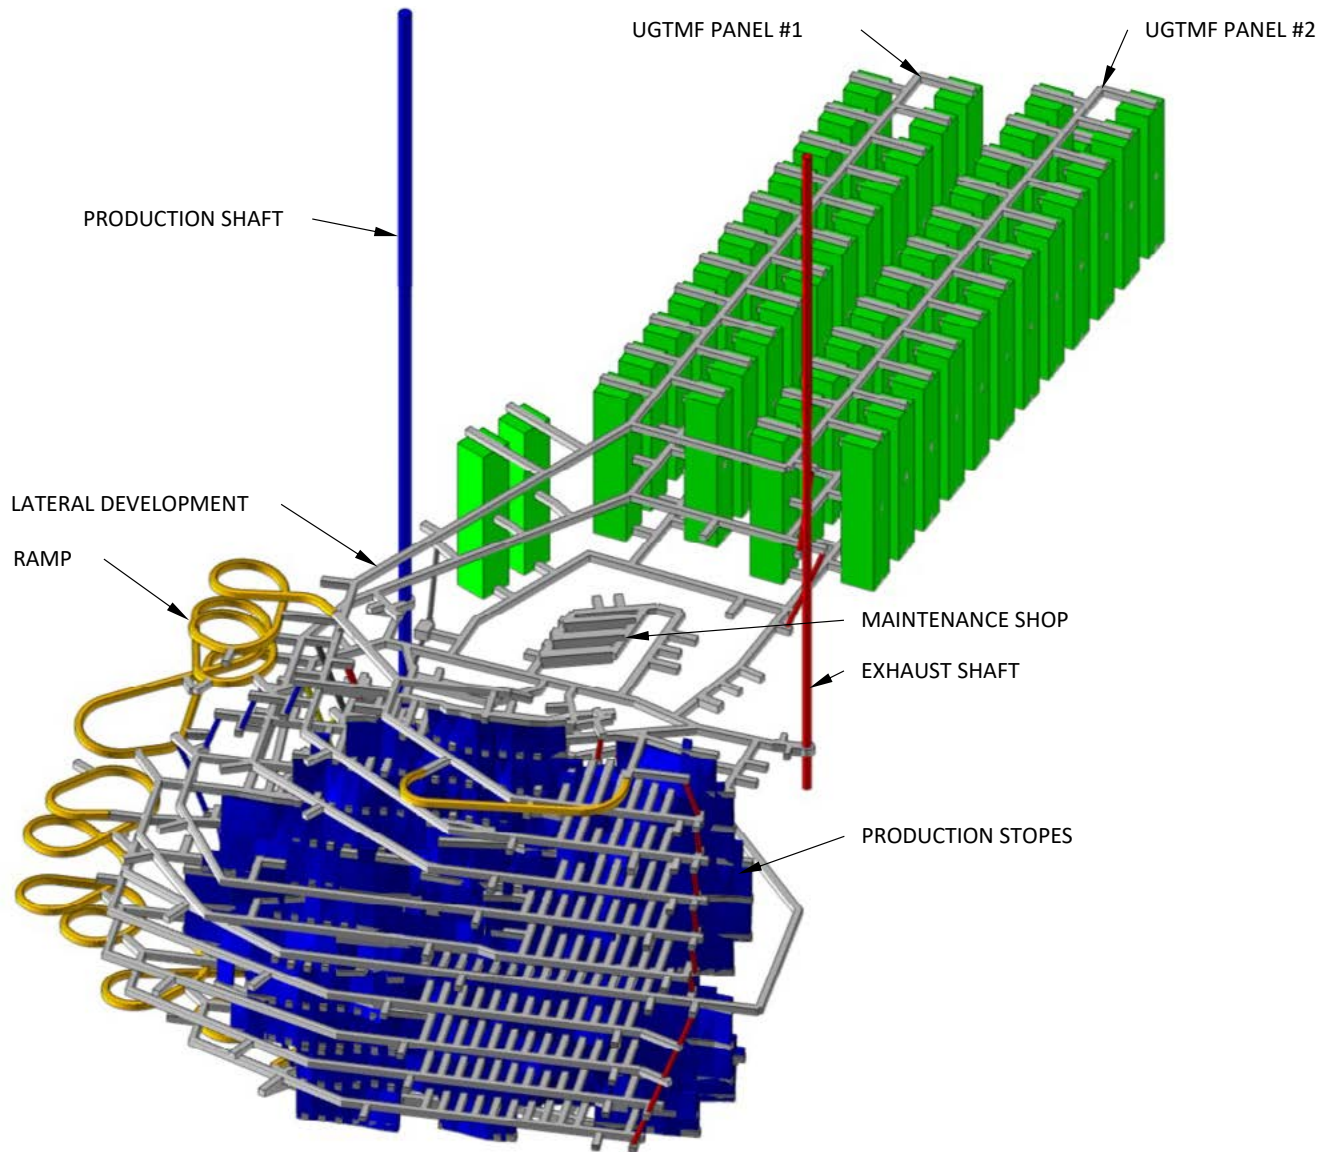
Rook I Project Underground Mine and Infrastructure Overview
